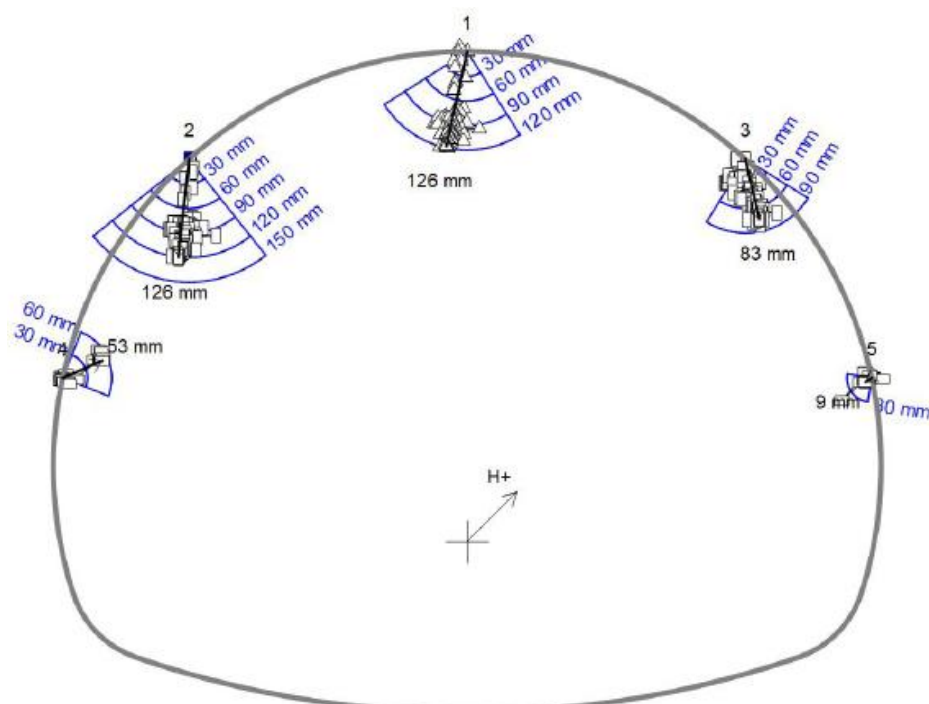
(e): Right tube Tunnel Cross section KP 26,616.000/ First measure: 15.05.2017, Last measure: 8.02.2018
